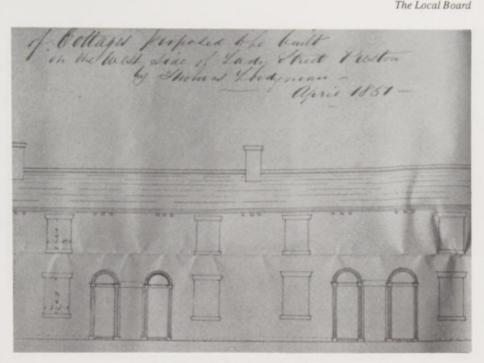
A front elevation, unusually included on one of the earliest building plans submitted to the Preston Local Board of Health, showing the design typical of hundreds of houses between 1850 and 1880.
